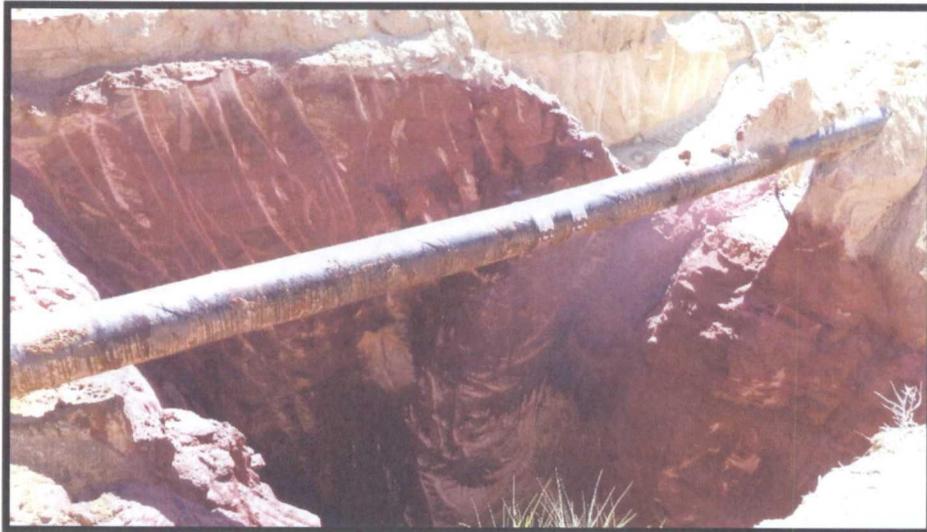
Trunk K #8 excavation after potassium permanganate application.
